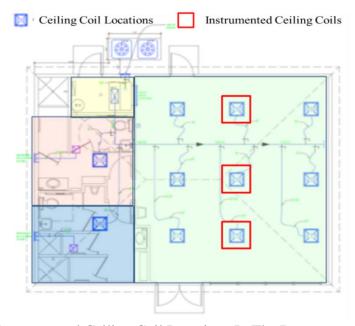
Instrumented Ceiling Coil Locations In The Demonstration Building
